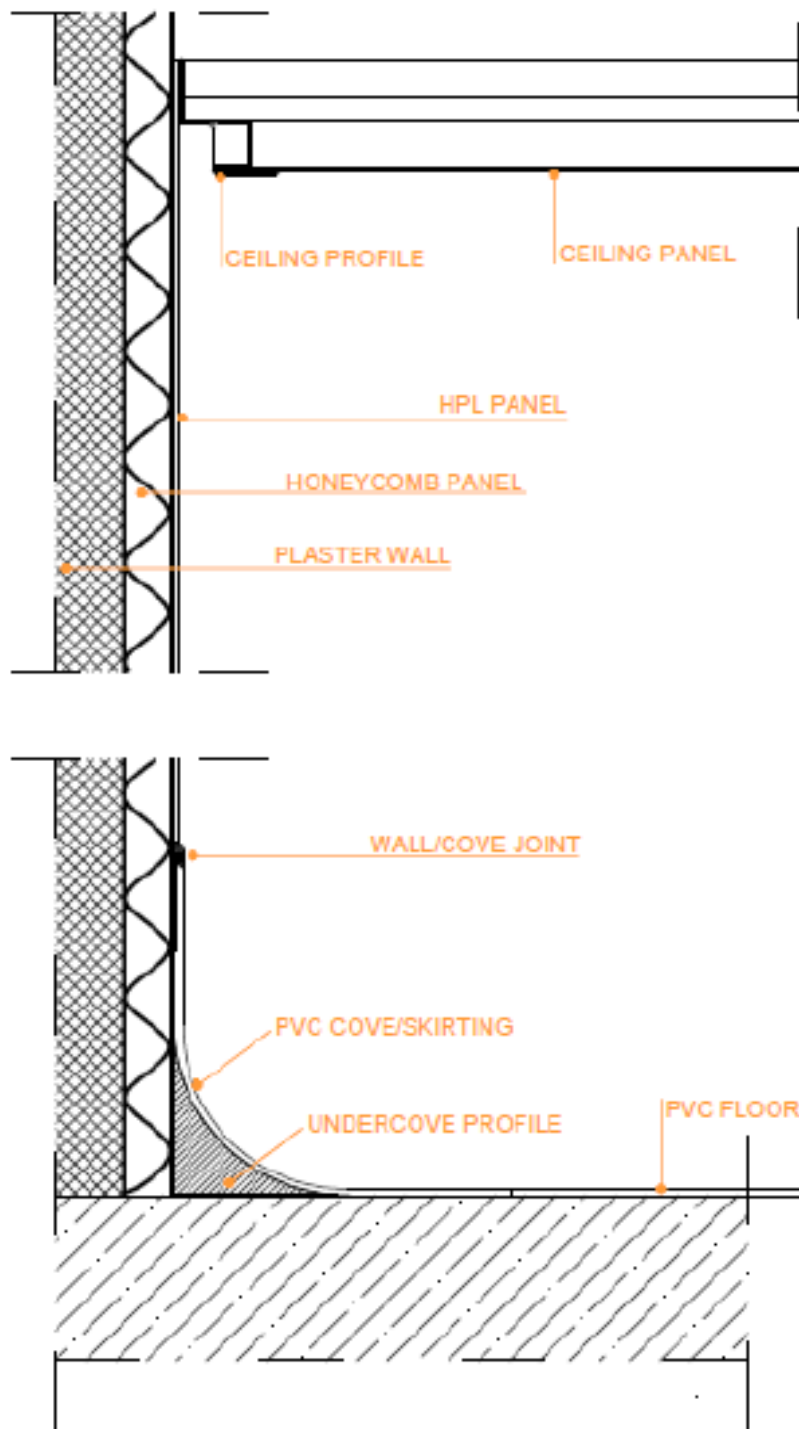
FLOOR –WALL –CEILING with traditional wall
